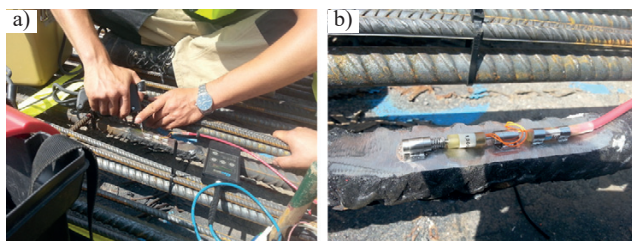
The installation of the sensors (a) and a close-up of the measurement point after installation – prior to mechanical protection (b)
